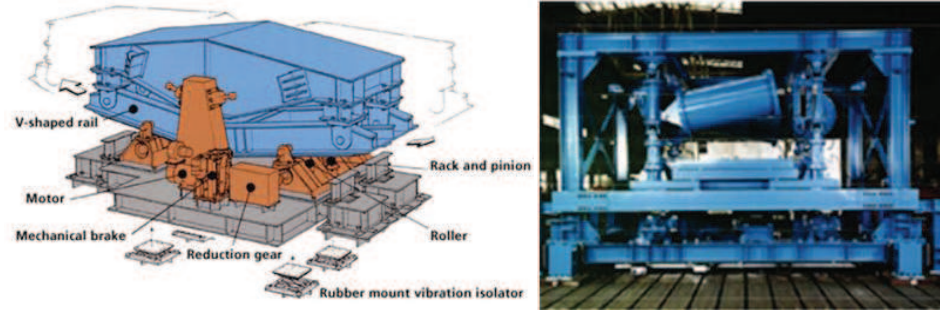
Left*: V-shaped HMD used in Shinjuku park tower, Japan; *Right*: Multistep pendulum damper used in landmark Yokohama tower [Courtesy: IHI Infrastructure systems Co., Ltd.]
